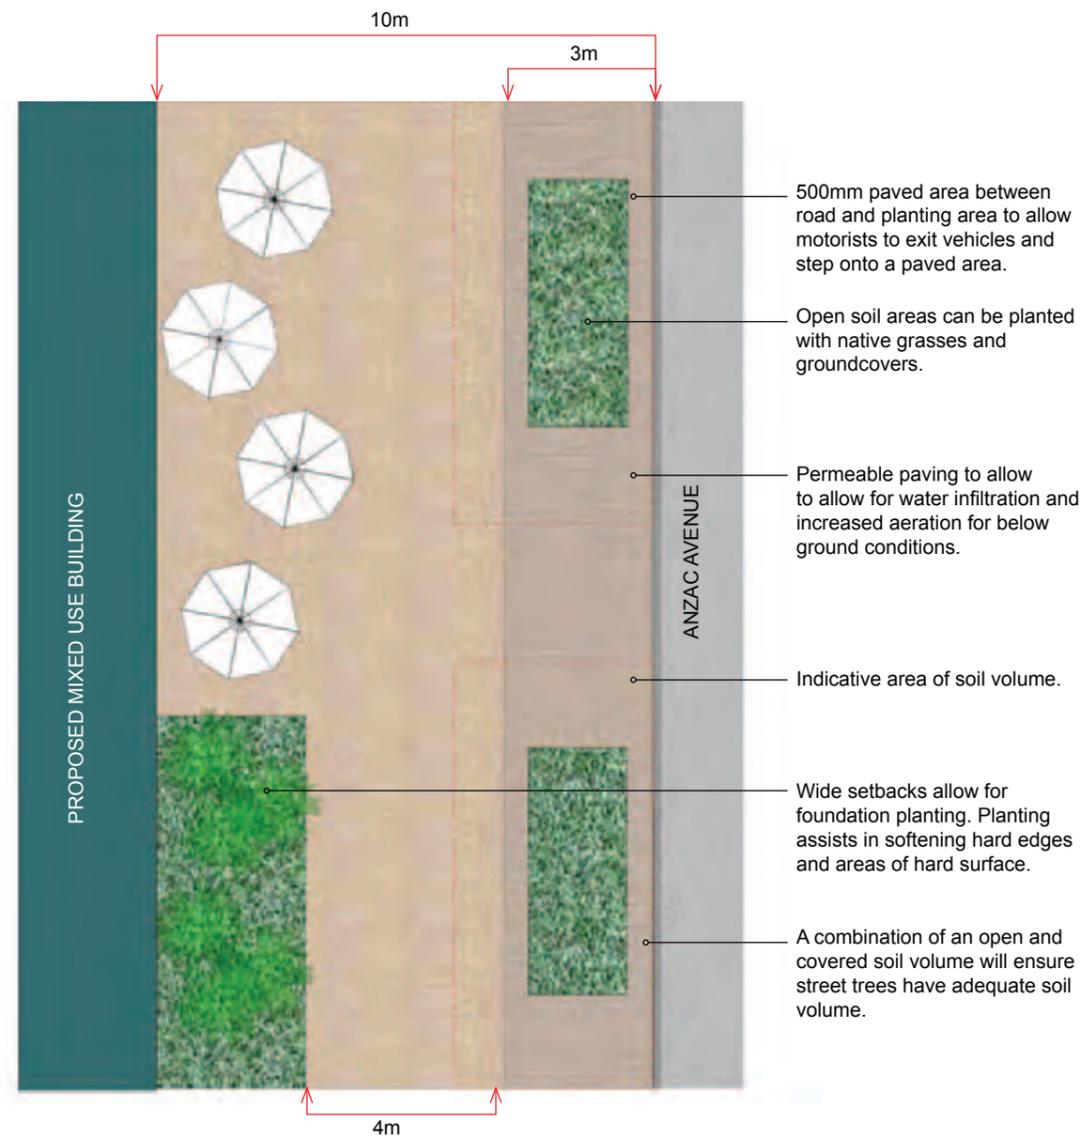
TYPICAL FOOTPATH DETAIL - MAIN STREET
